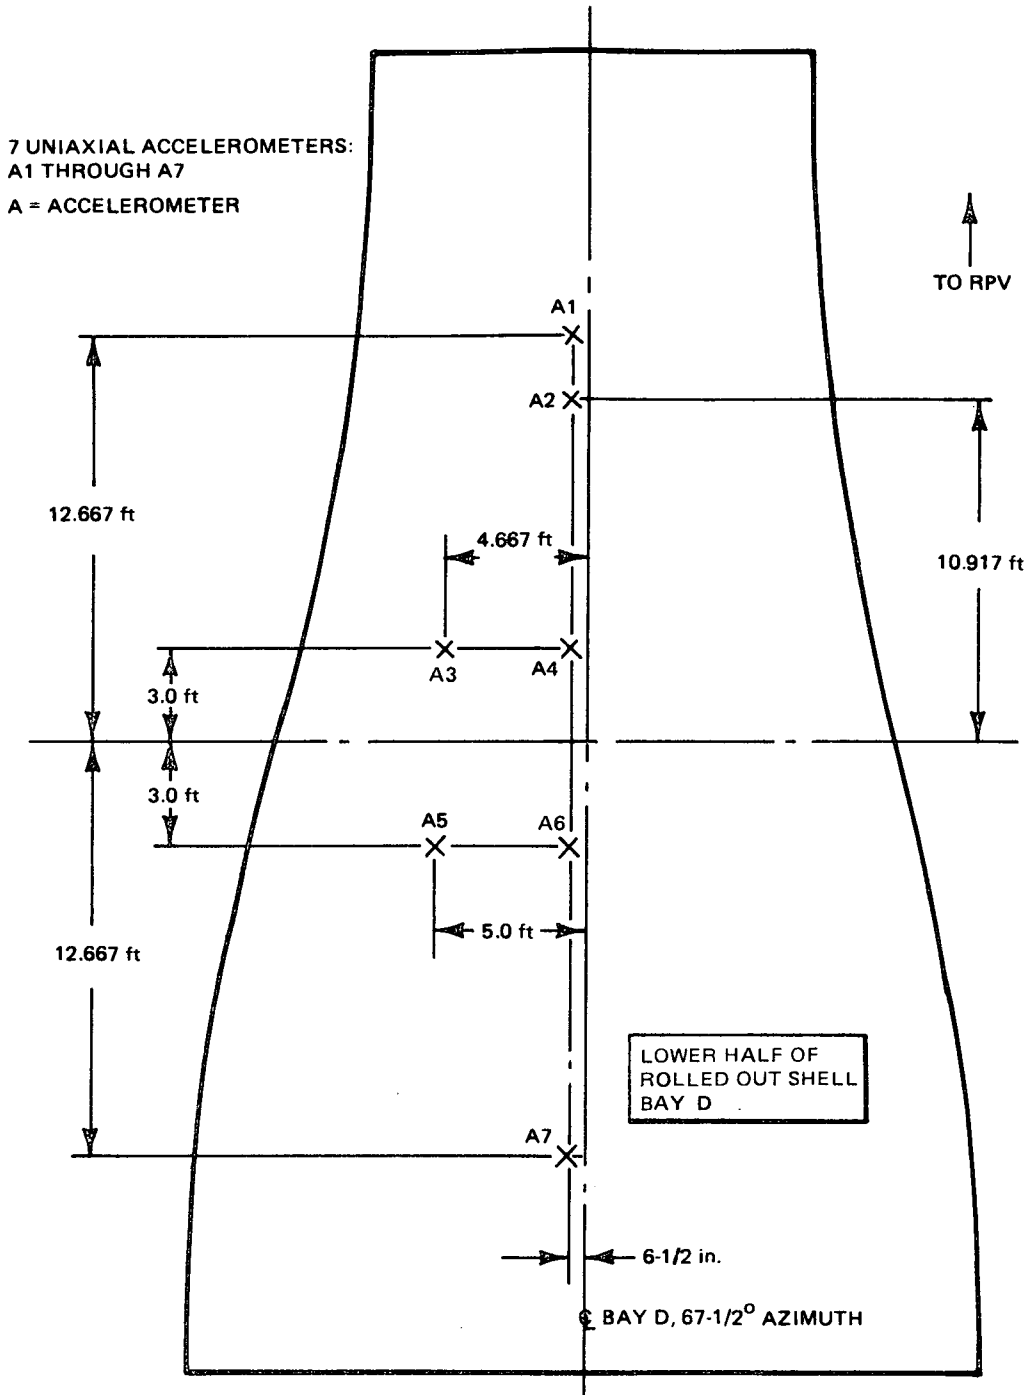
Accelerometer Location on Outside Shell - Half-Shell Layout of Bay D (view from inside torus looking out)
